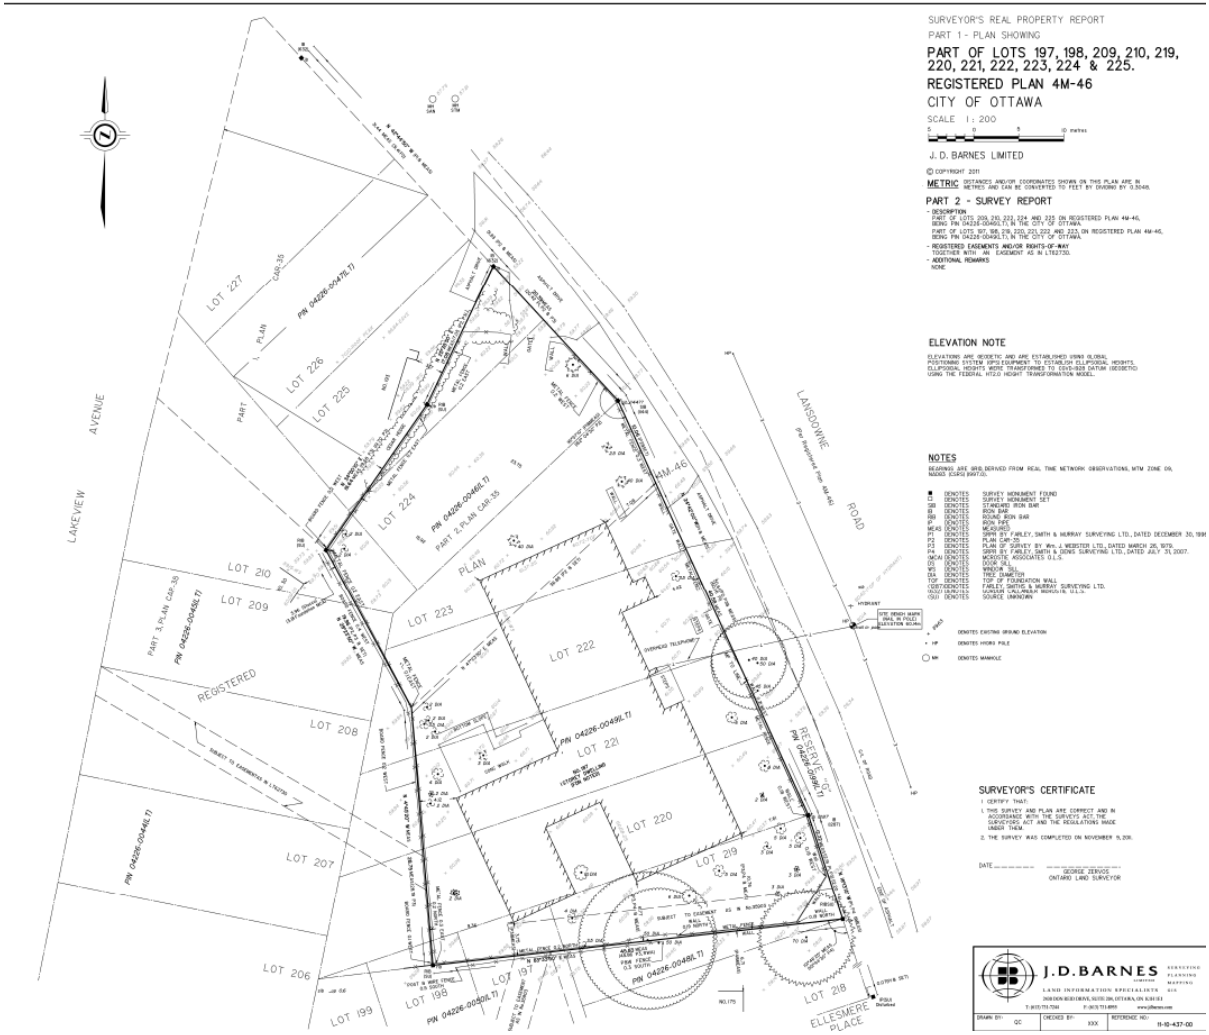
Site survey provided to Contentworks by Julian Jacobs Architects. Dated 22 November 2011.
